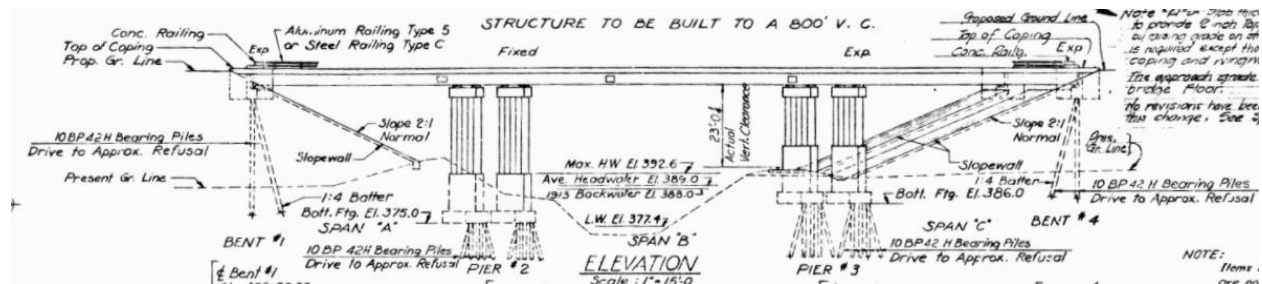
Elevation View of Structure I64-07-02367 BEBL (NBI 33280) (INDOT, 1964)
